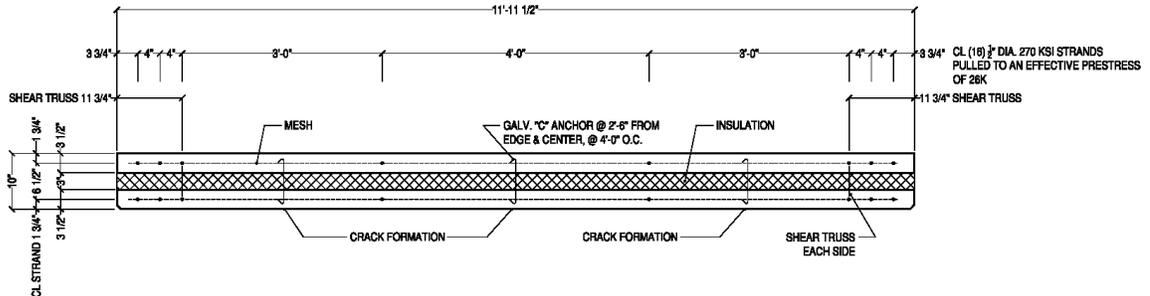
Typical cross section of the wall panel with crack formation locations
